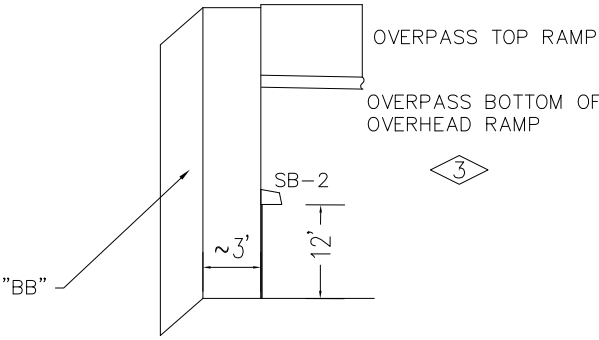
DETAIL "AA" LOOKING NORTH ALONG OVERPASS WALL
